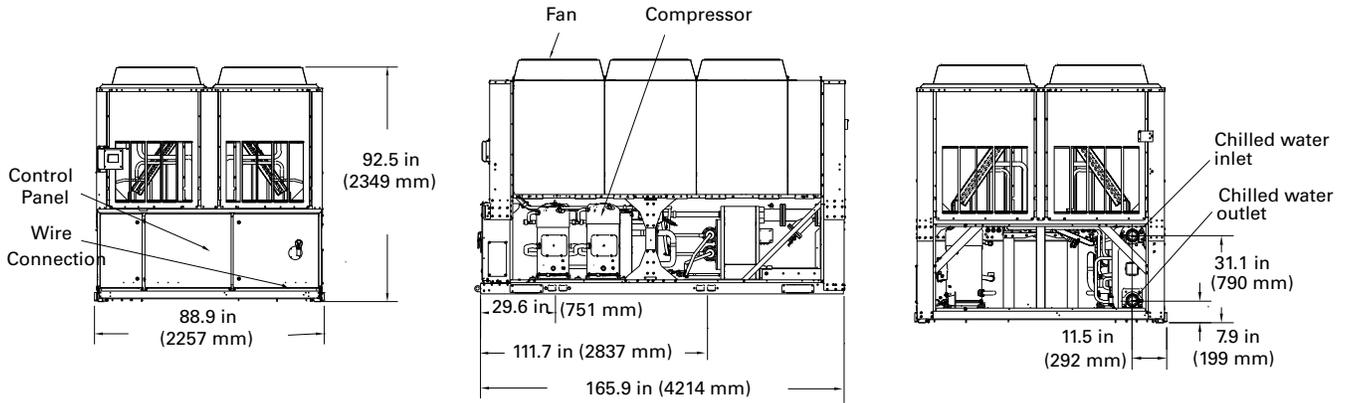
CGAM 80 and 90 ton (compact version)- pump package and buffer tank water connections
